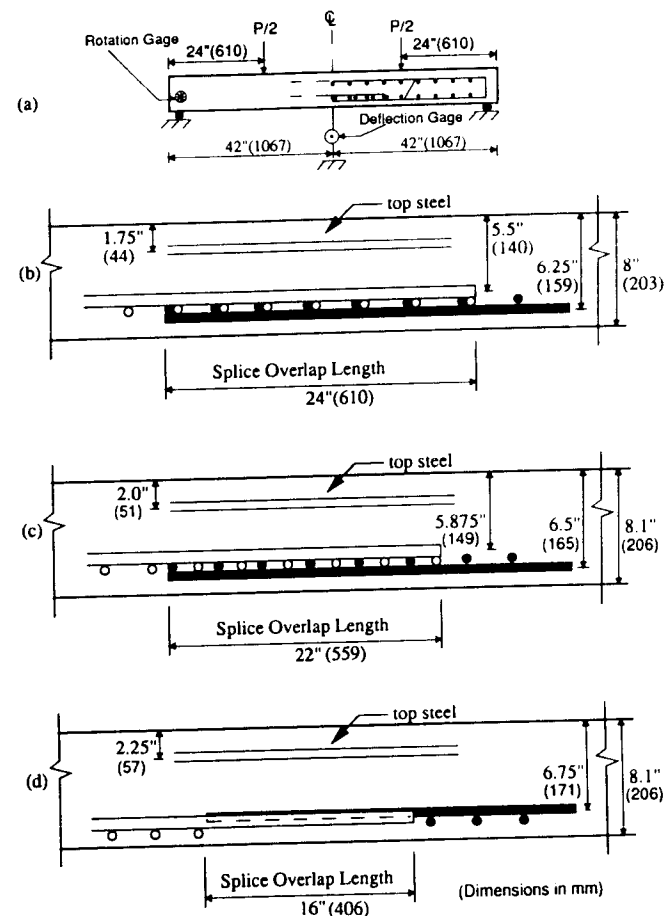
Splicing of Welded Wire Fabric: (a) Test Setup; (b) Transverse Wires in Contact; (c) Transverse Wires Separated by Concrete; (d) No Transverse Wires in Splice Zone
